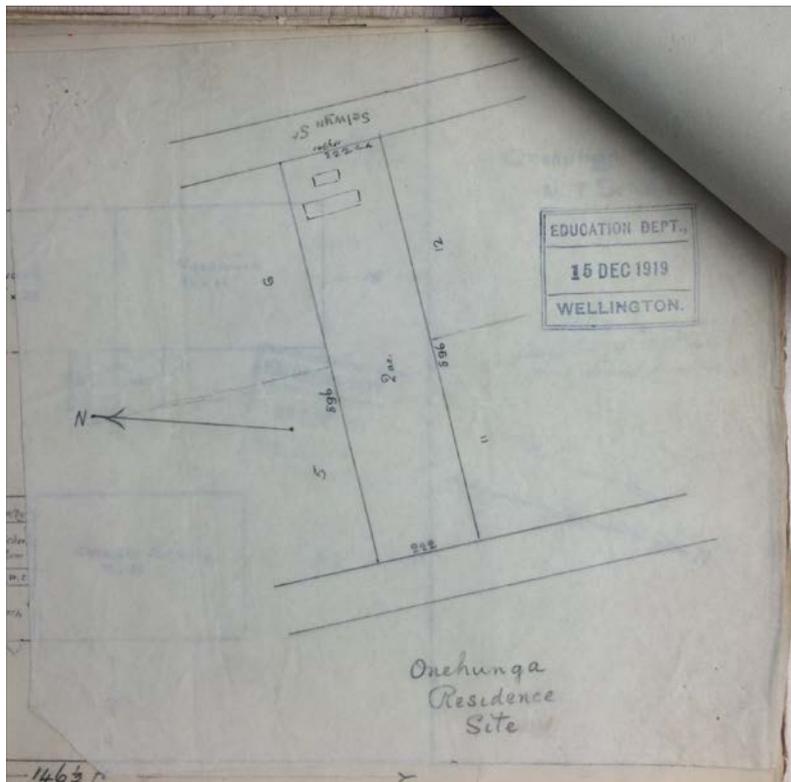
Proposed plan December 1919. Site plan of the December 1919 design. (Education Department. (1919-1981) Buildings and Sites - Onehunga Manual Training Centre (R22887276) at Archives New Zealand)
